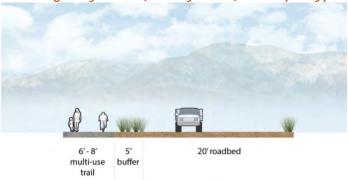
Off-Highway Trail (County Road) Concept Typical Section
